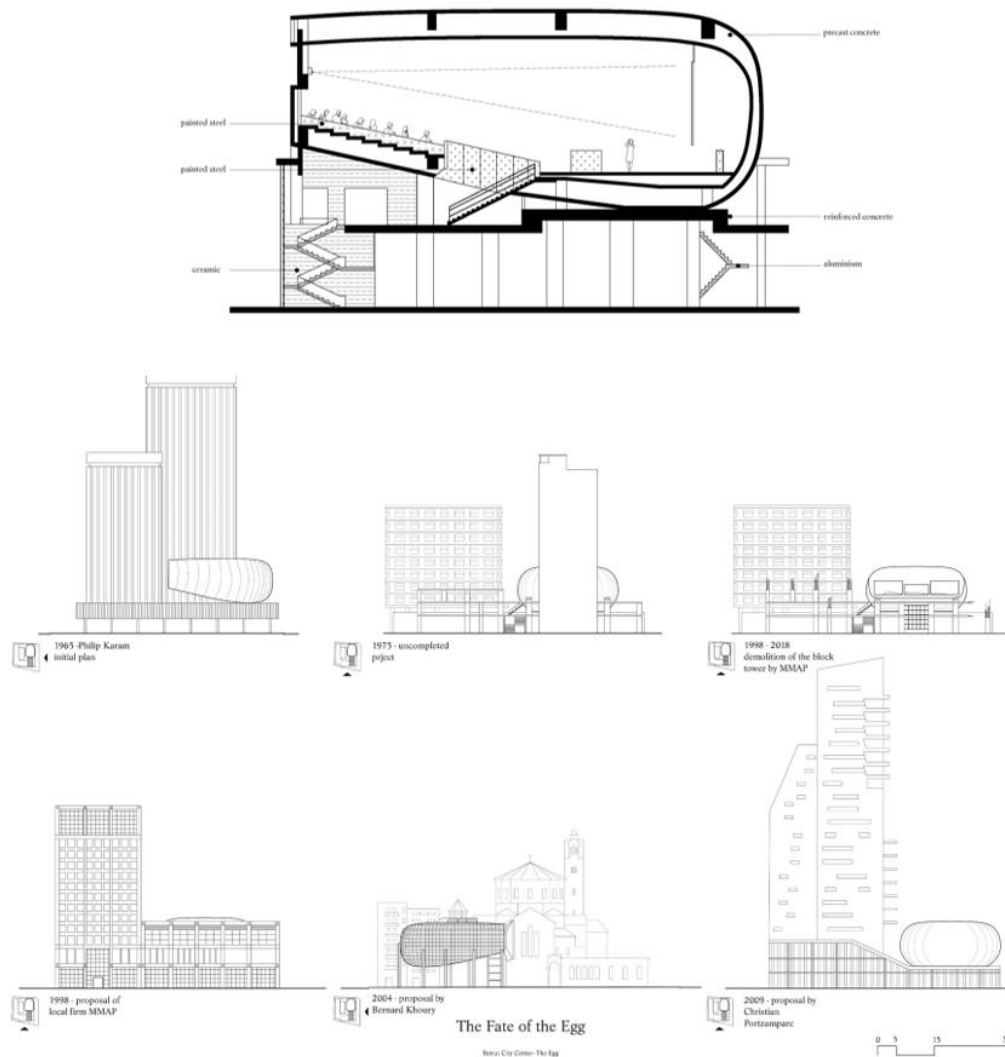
Architectural Drawings -Sections and Elevations- of how the building was or ‘could have been’ (Charlotte Malterre- Barthes Website, 2018)
